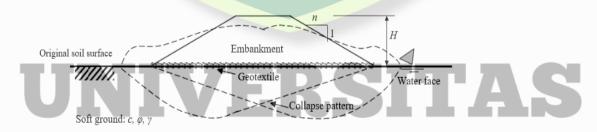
Bearing capacity failure pattern of geotextile-reinforced soft subgrade (Suyuti and Rizal, 2023)
